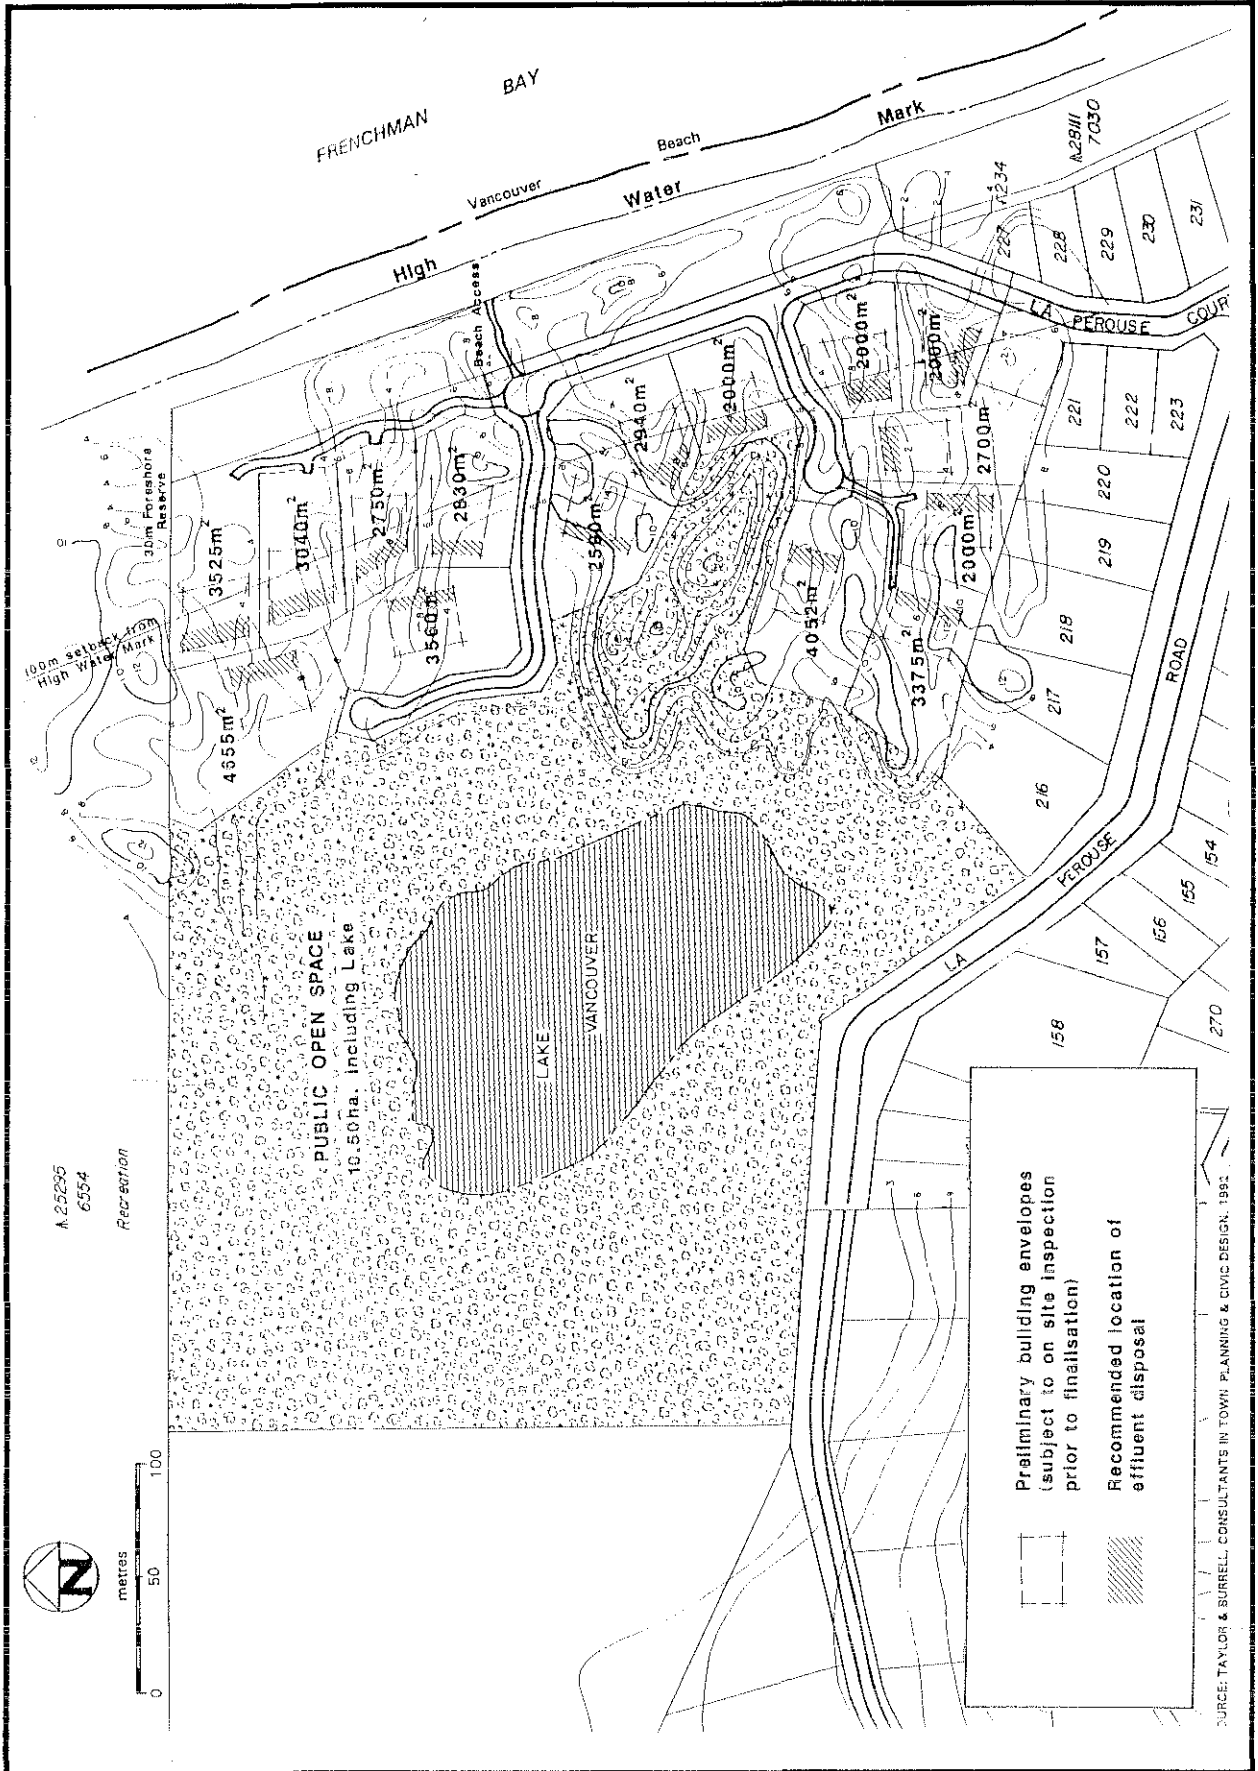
Plan of subdivision (from Alan Tingay & Associates, CER)
